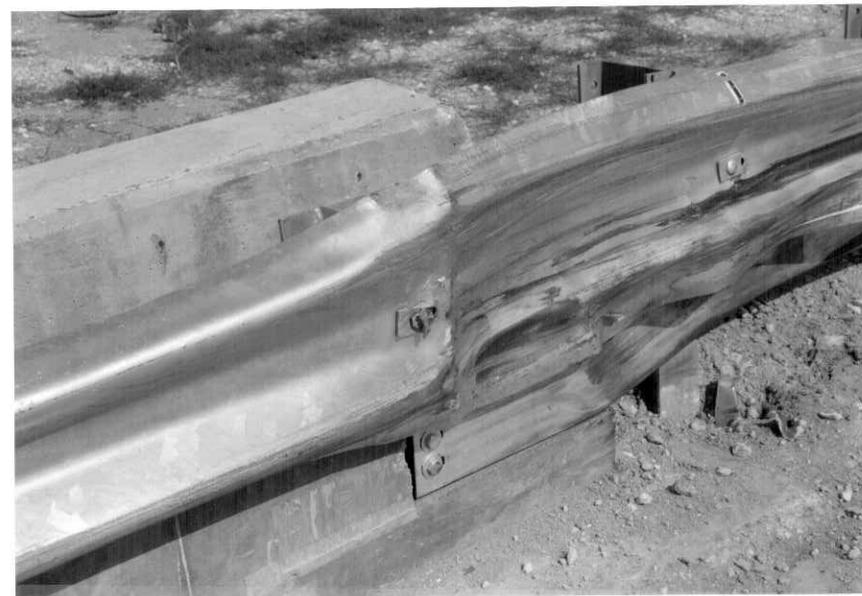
Arizona guardrail transition to concrete barrier after test 7155-1
